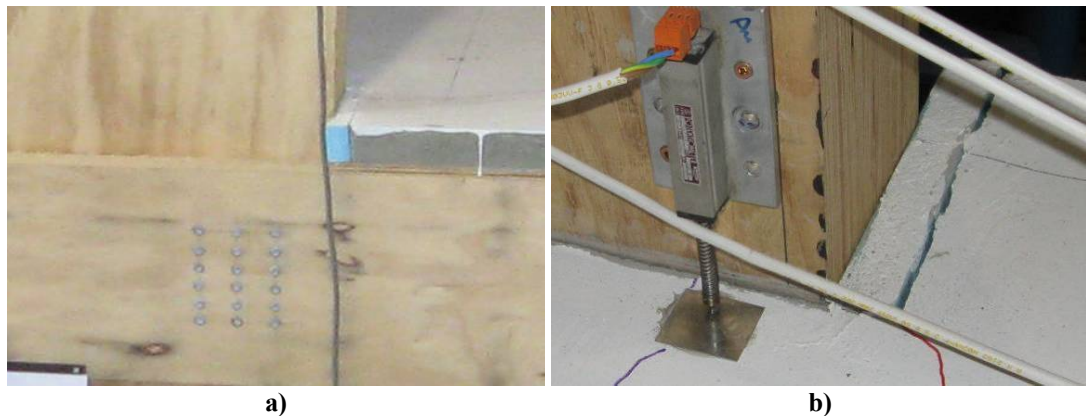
Deformation around wall edges: a) Position of flexible foam spacer b) Deformation around spacer at 2% Drift
